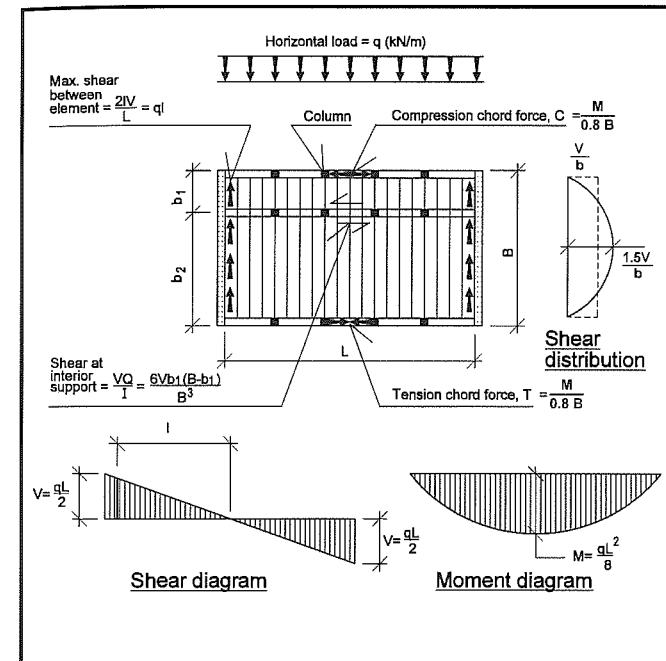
Analogous Beam Design Of A Floor Diaphragm
